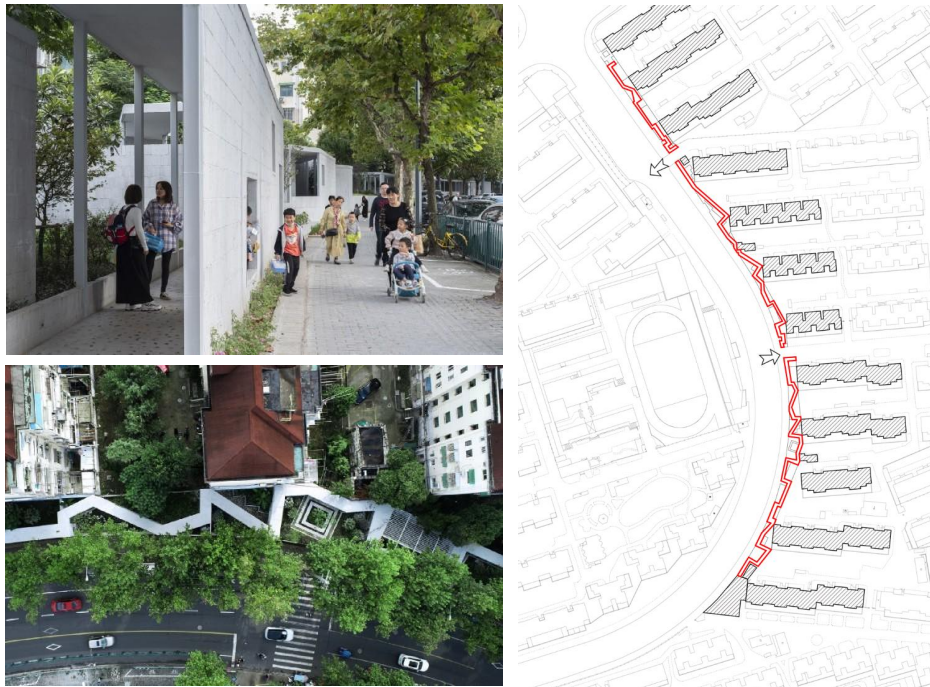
Garden Wall at Changliyuan, Shanghai (image source: online)
